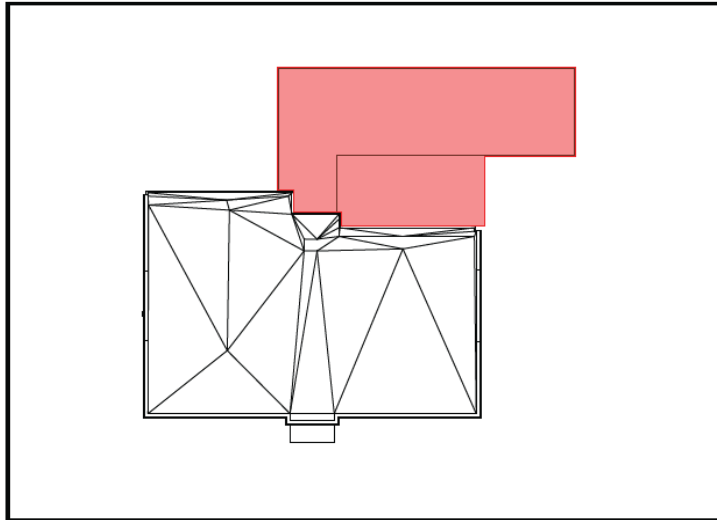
Roof plan of proposed demolition of rear annex. EVOQ.
